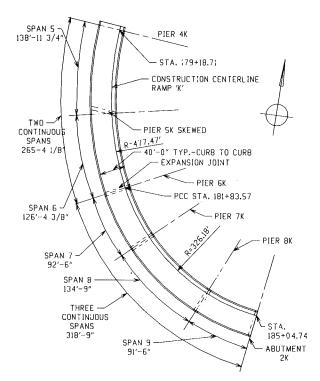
General layout of ramp K at Philadelphia International Airport.
